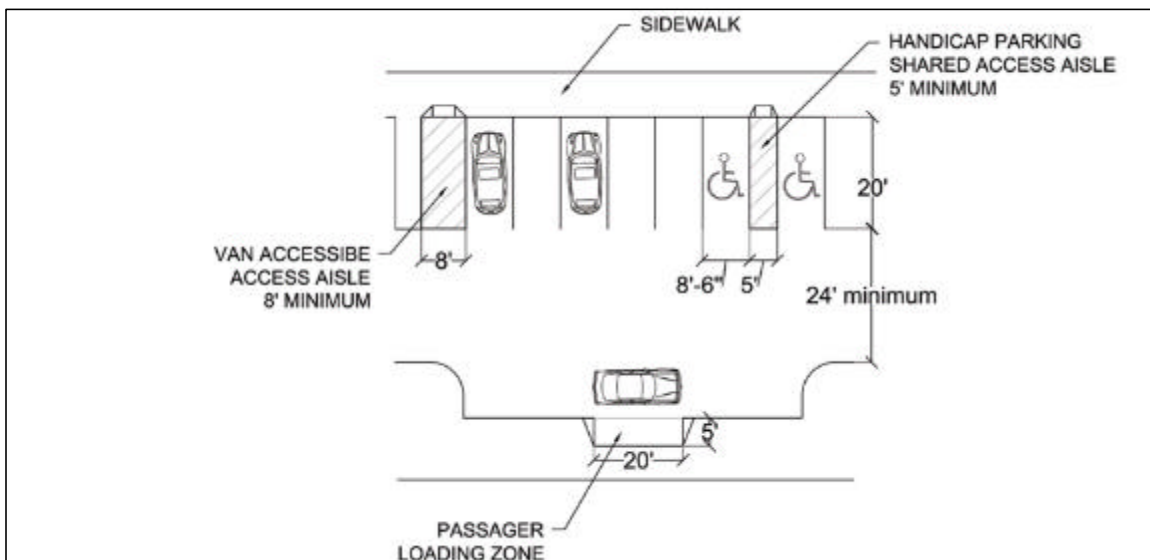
J Van Access, Handicap Access and Passenger Loading Dimensions
